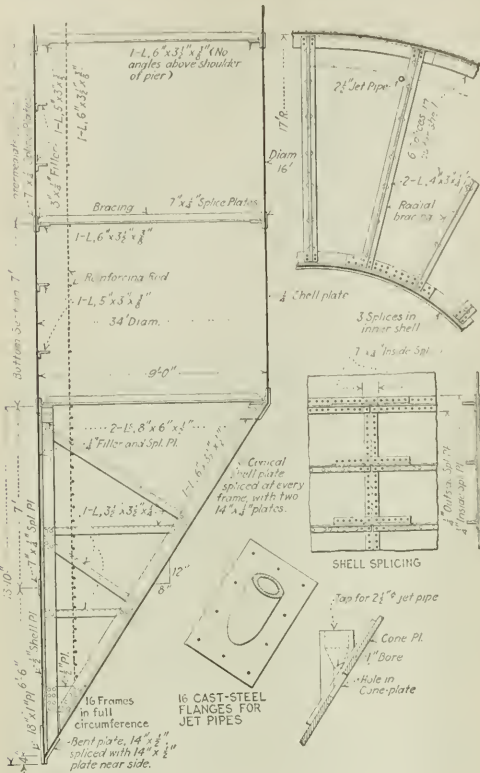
STEEL SHELL FOR CONCRETE PIER
